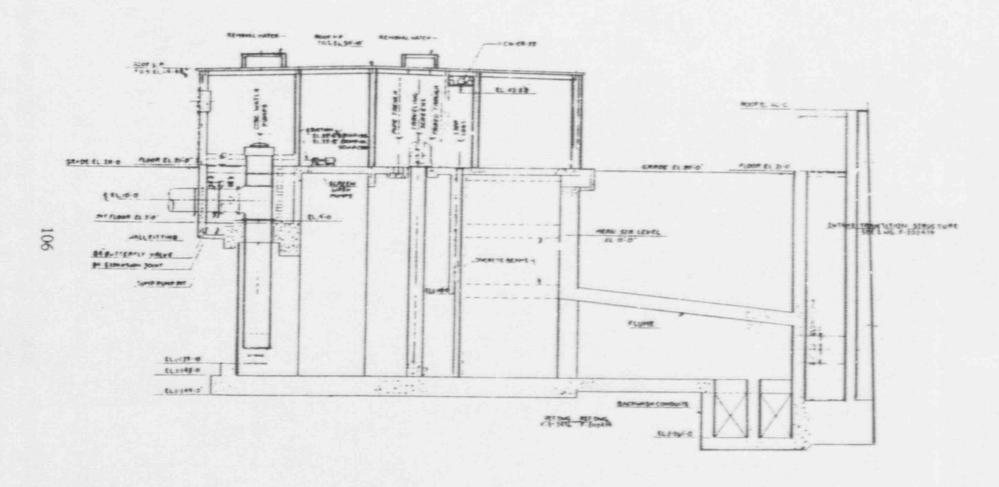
Seabrook 1 Service and Circulating Water Pump House Section, Looking North
